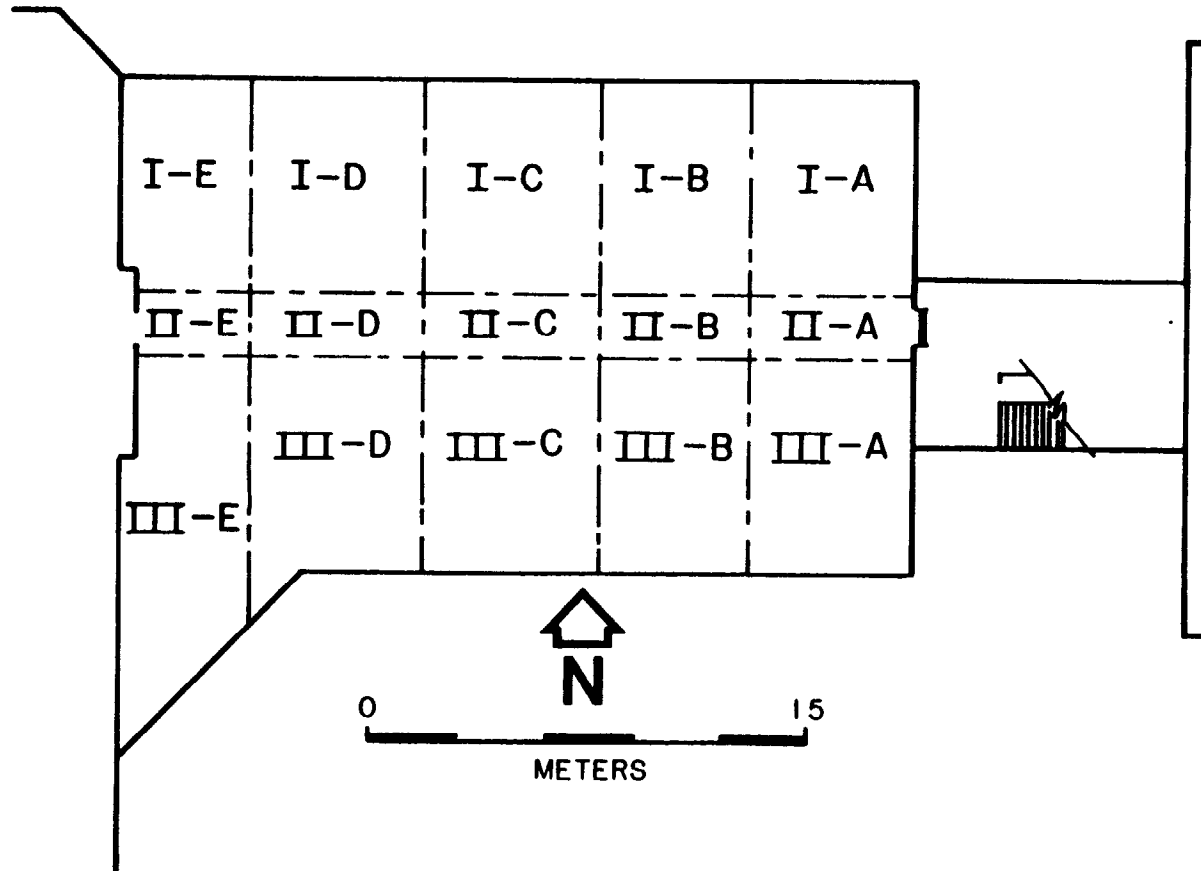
Jones Laboratory Fourth Floor Attic Sections.
